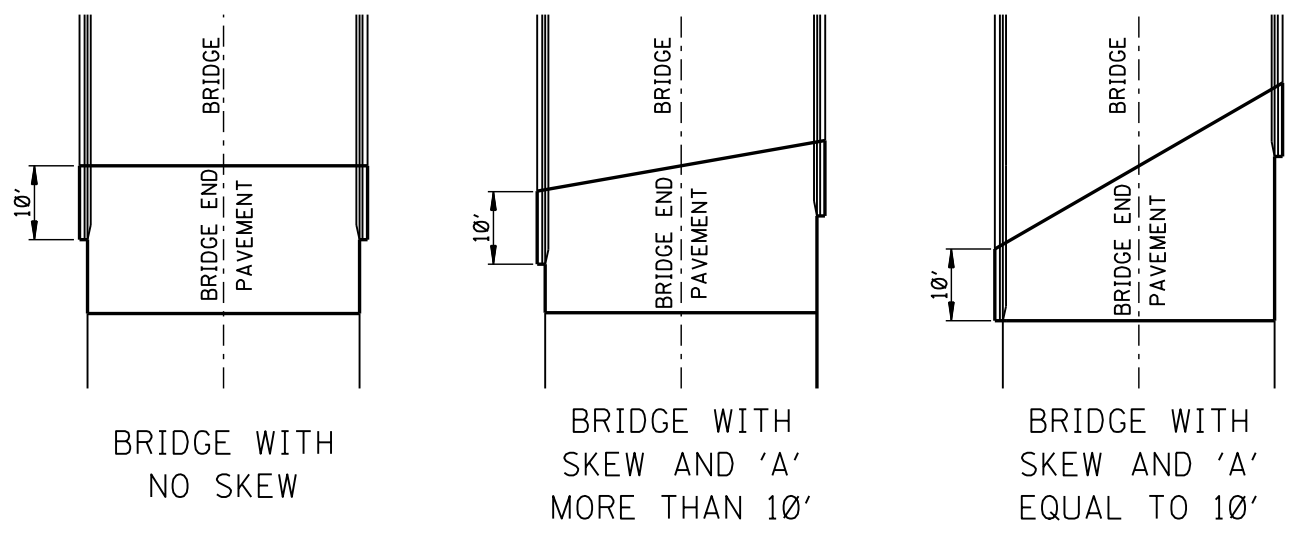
DETAIL SHOWING METHOD OF SEATING BRIDGE END PAVEMENT ON BRIDGES WITH NO PAVING BRACKET
